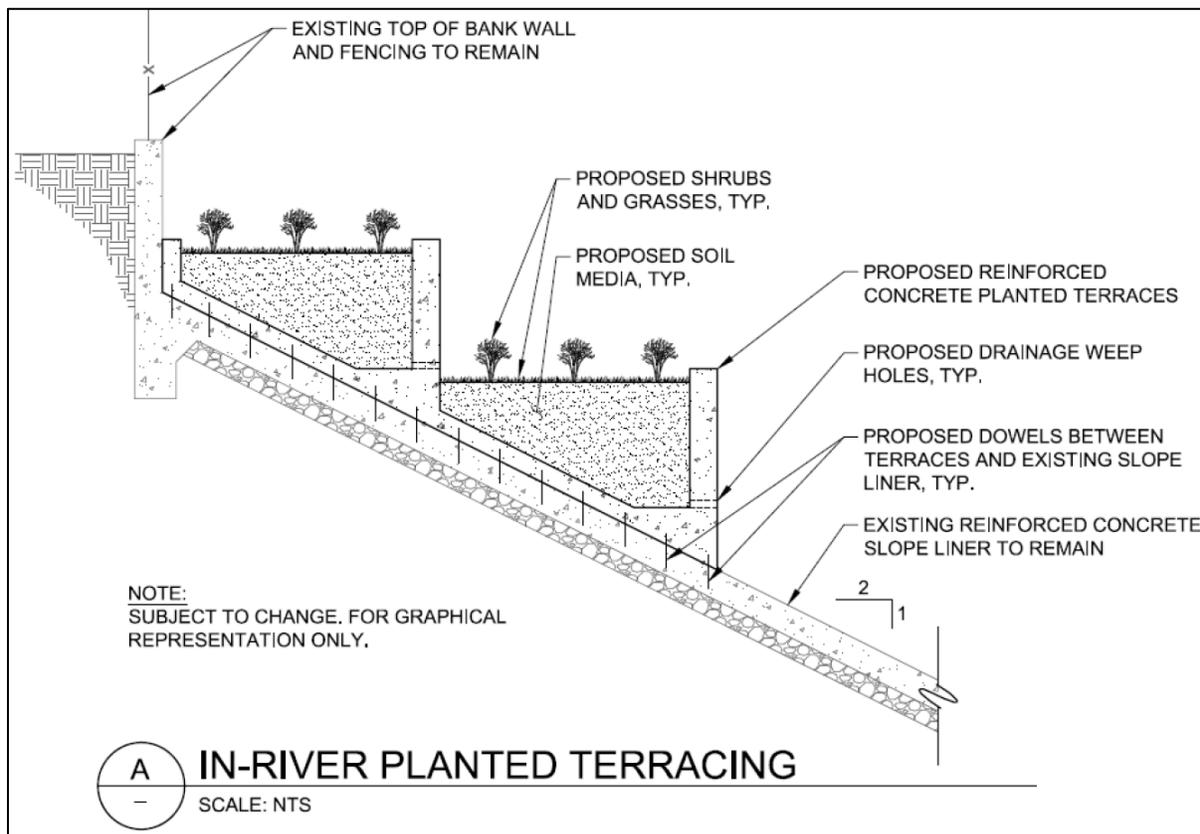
Conceptual plan for planted terraces (LABOE, 2019)
